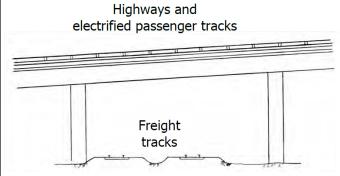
Bridge elevation view with two electrified passenger rail tracks carried on the bridge and two freight rail tracks below the bridge.
